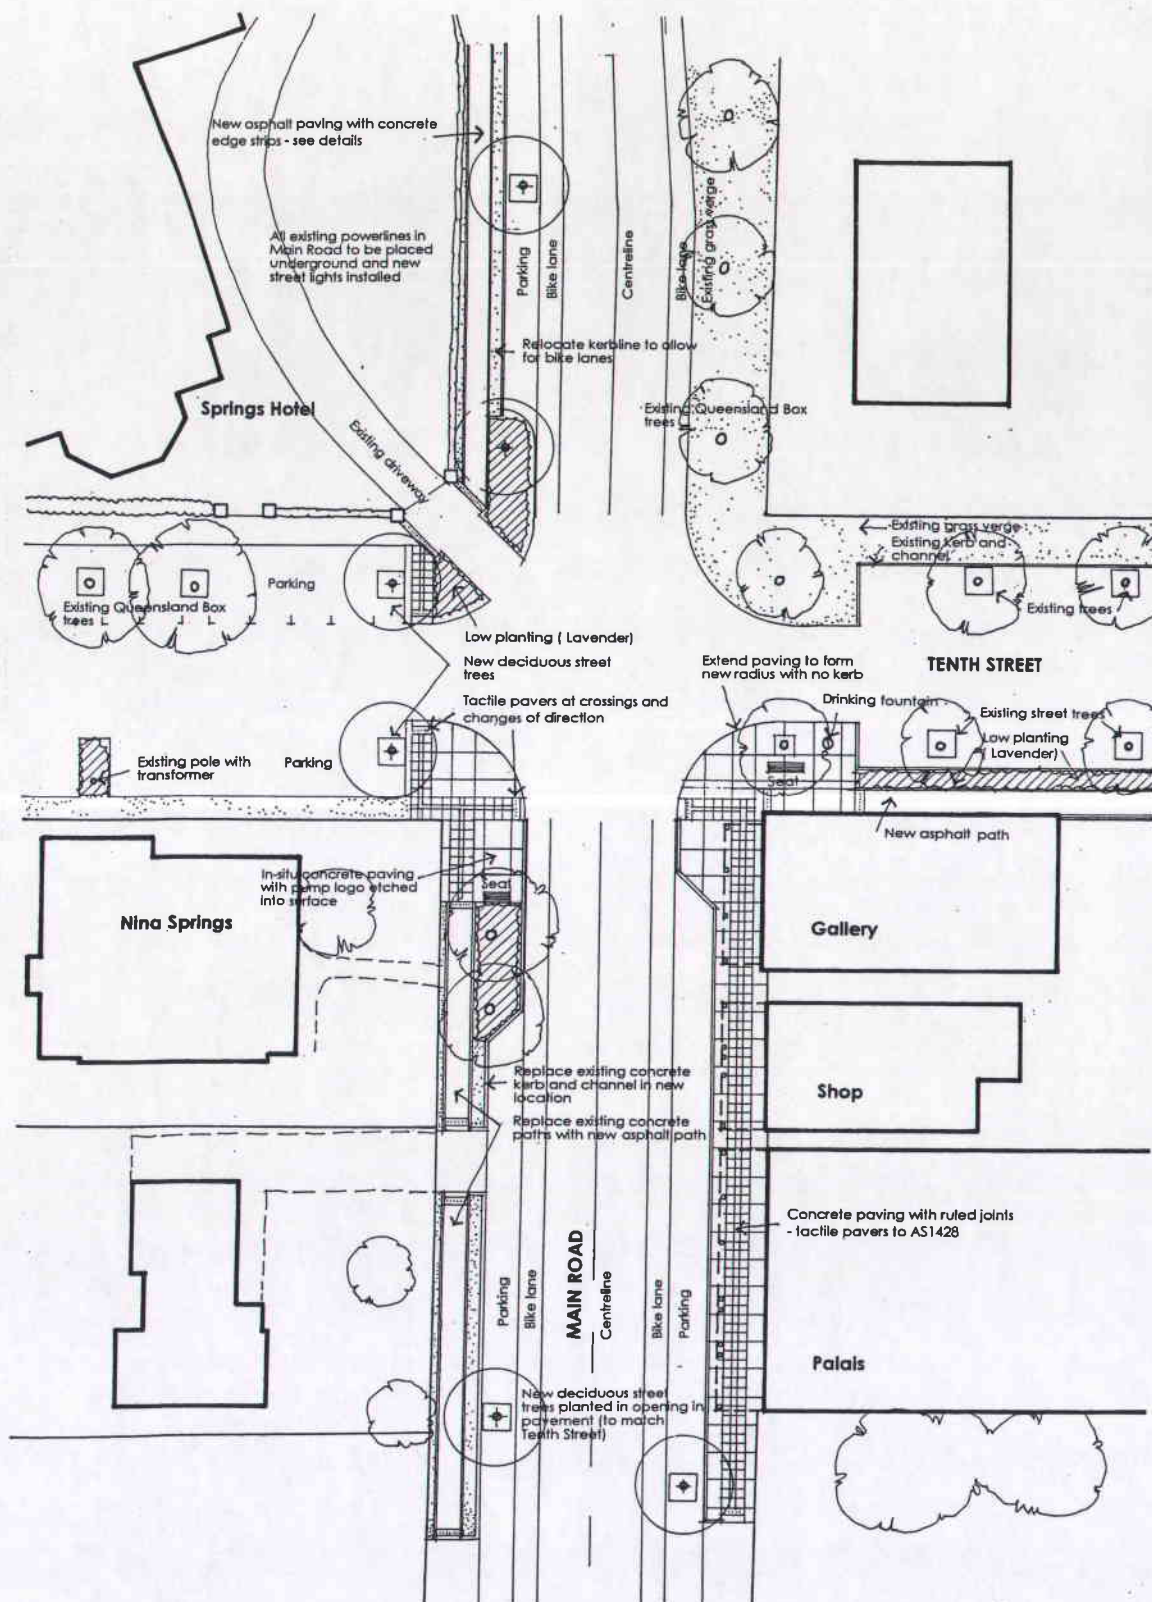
Plan for Intersection for Main Road and Tenth Street
